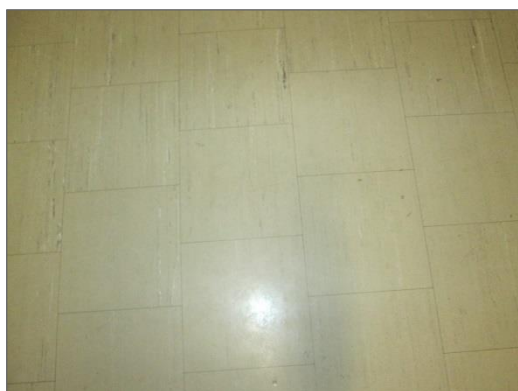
Asbestos-containing 9" x 9" brown with black and white streak floor tile.
